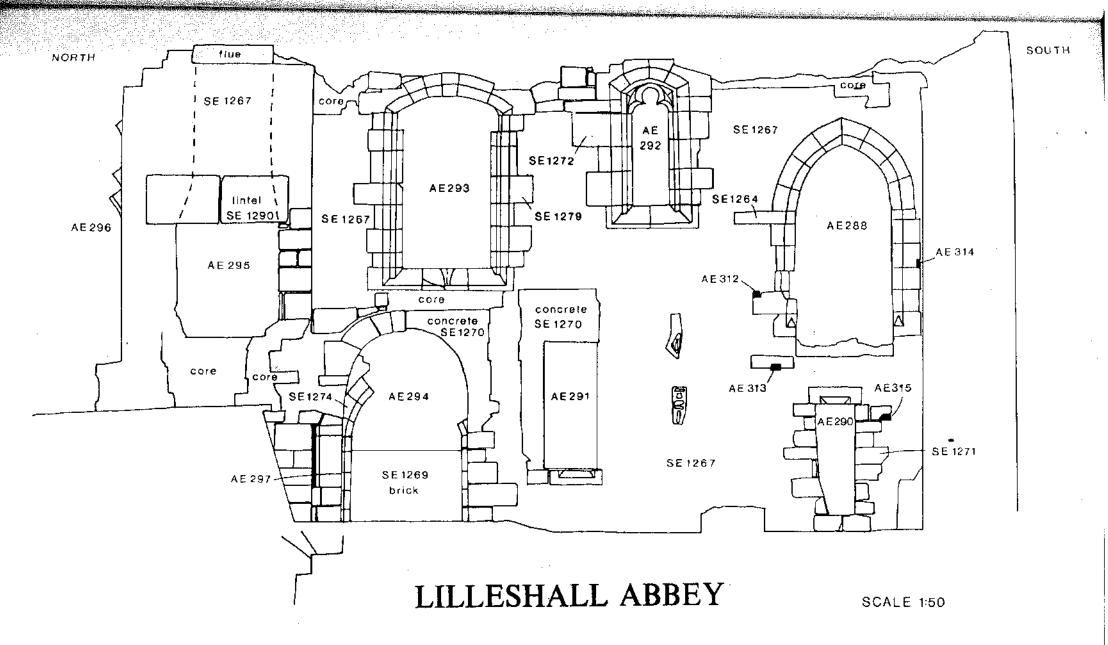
The Frater; West Wall, West Exterior Elevation. (Sterenberg et al.)
